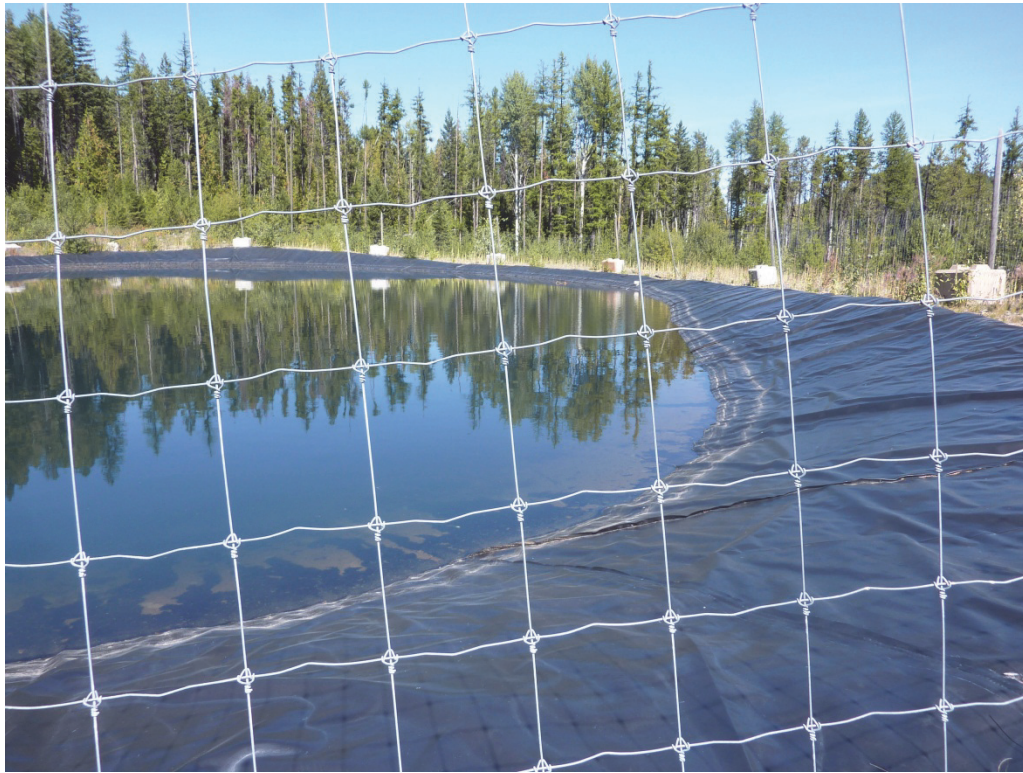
Emergency Water Storage Pond – Liner and Dam Crest
